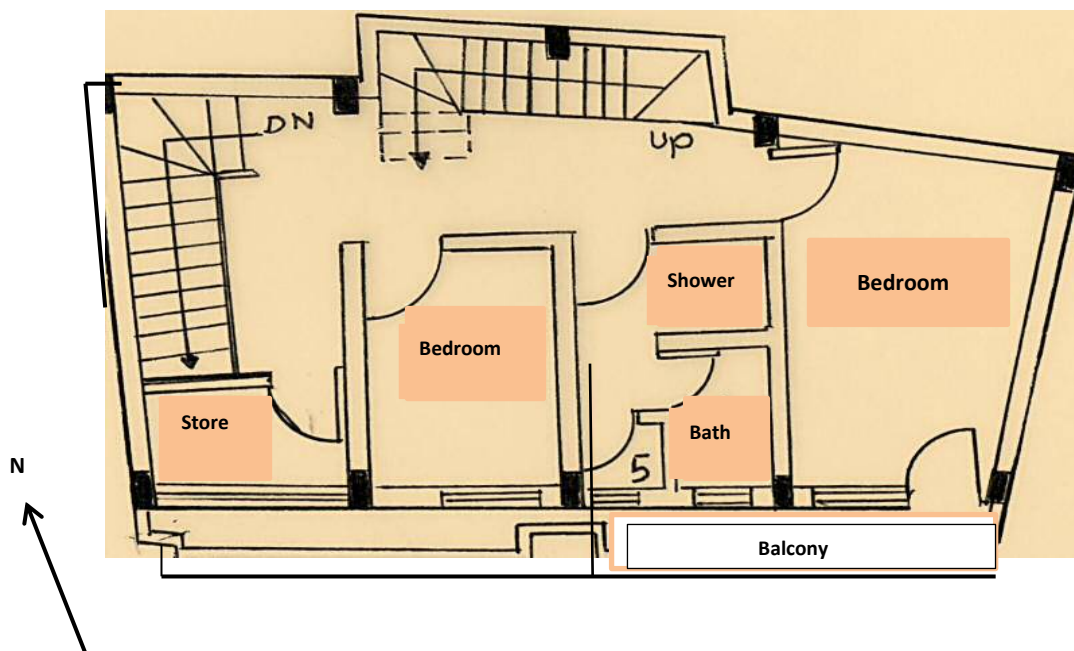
First floor level plan of modern house No. 5. Scale: 1:100 (Researcher)
